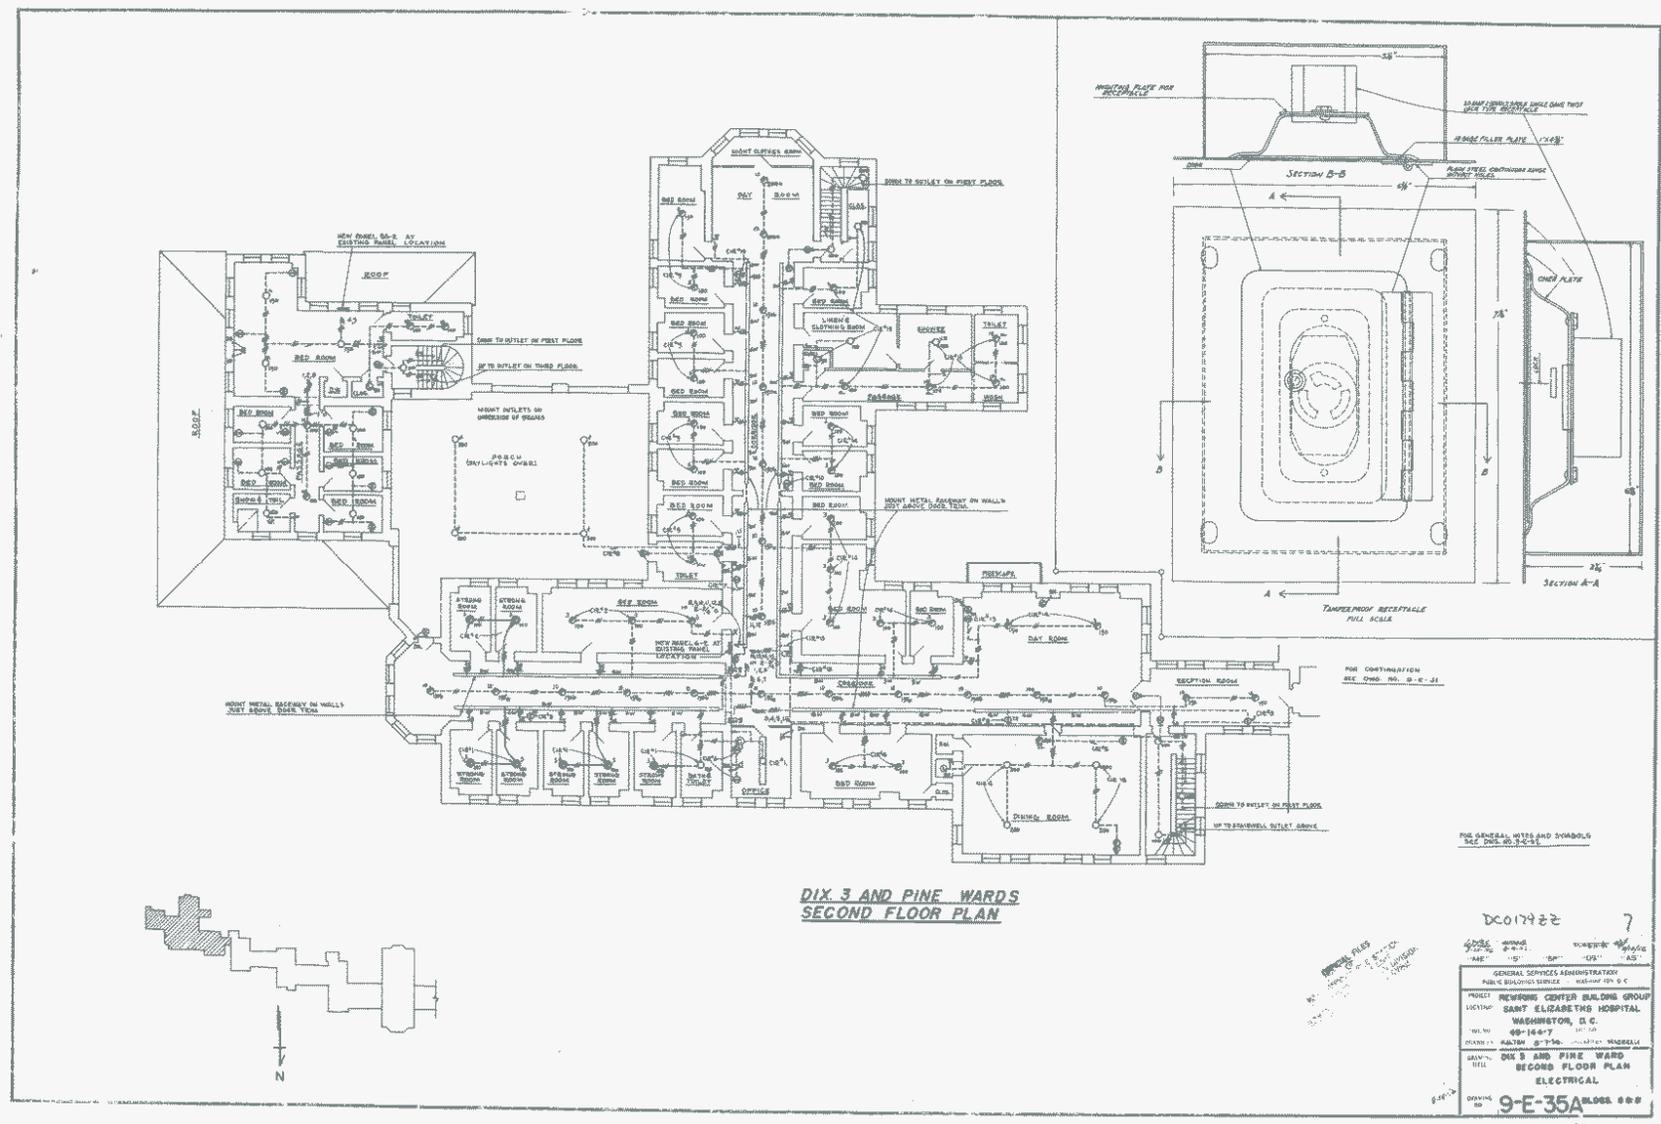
Second floor plan of Pine showing electrical improvements, 1956. Source: GSA Archives, image DC0179SE0007.
